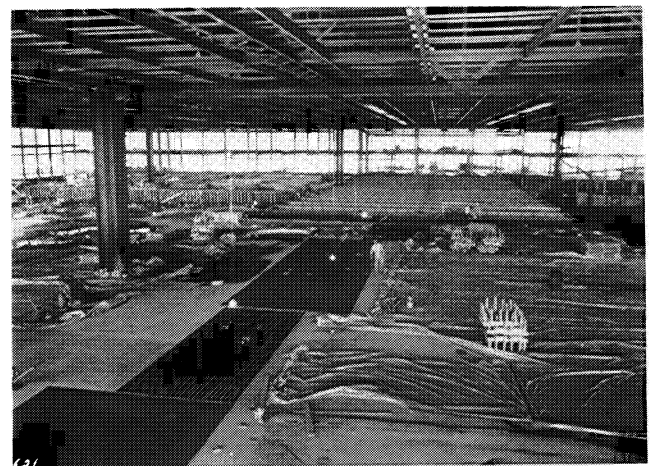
Cobo Hall, Hall B, over John C. Lodge Expressway. Note lightweight concrete being placed in sections.
